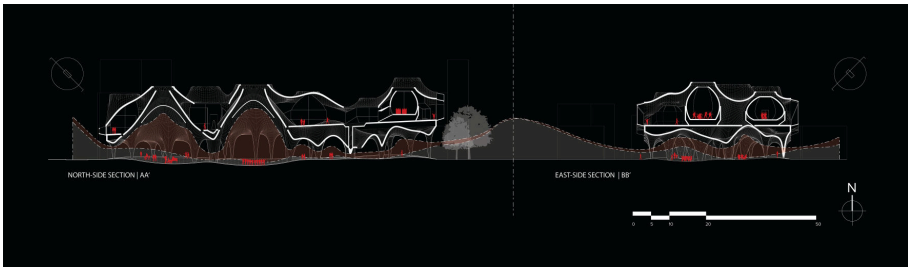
Sections of the building, showcasing the vaulted geometry of the ground floor envelope.
